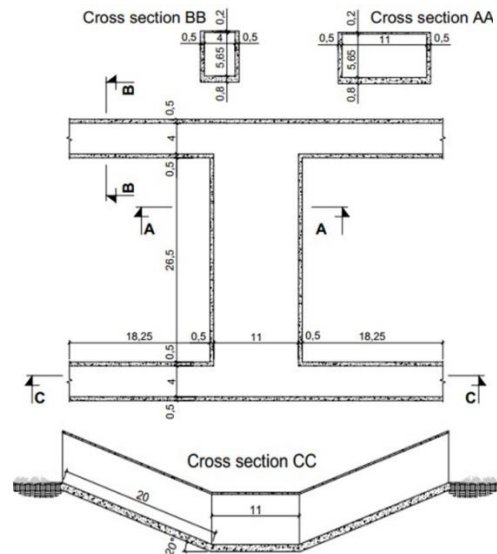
Plan and cross-sections of the pedestrian tunnel [7]
